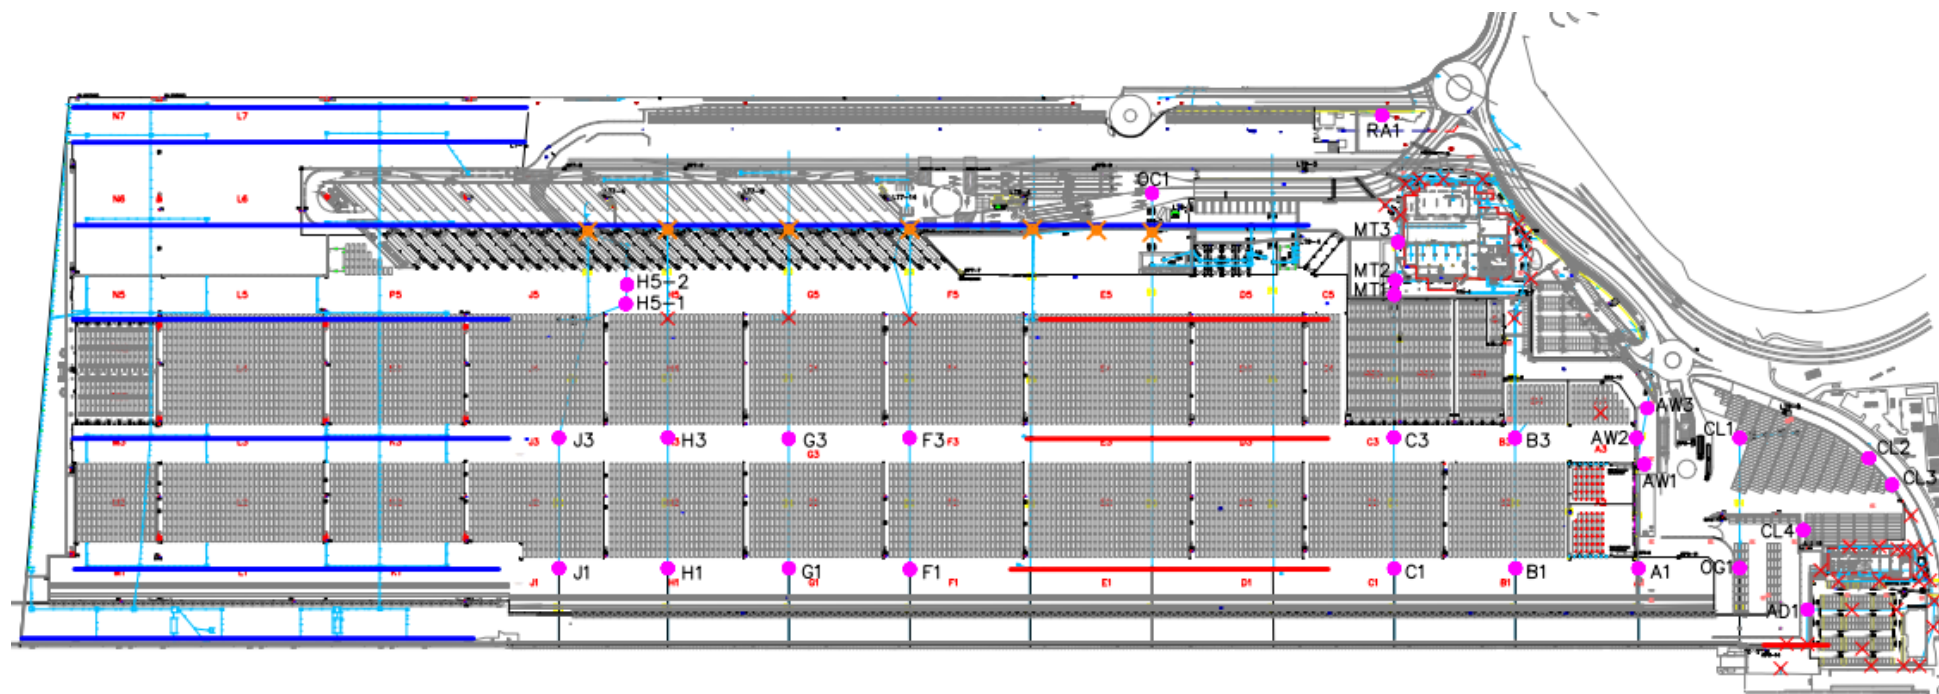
Patrick Terminal Stormwater Drainage System
